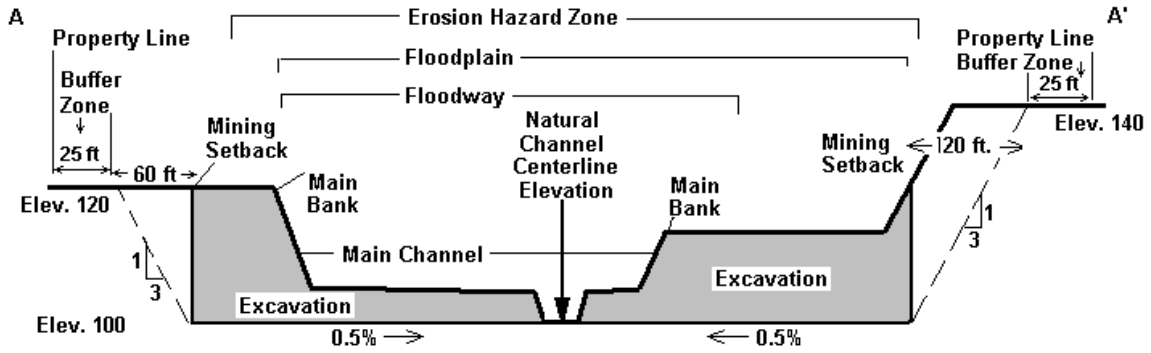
Main channel and floodway excavation geometry for streamlined floodplain use permits. Plan view is shown in Figure 8-3. This pit is 20 feet deep (Elev. 120 – Elev. 100). The shaded area marked “Excavation” is the area that can be mined under the streamlined permit process. Material may not be excavated from areas outside the shaded zone unless an engineering analysis is submitted. (FCD Maricopa, 2004)
